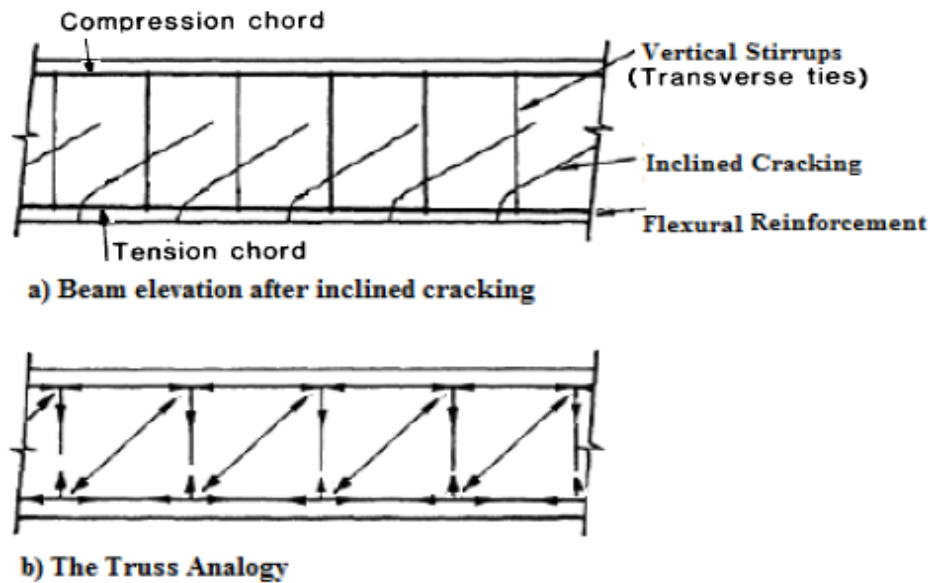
A Typical RC Beam Containing Shear Reinforcement.
